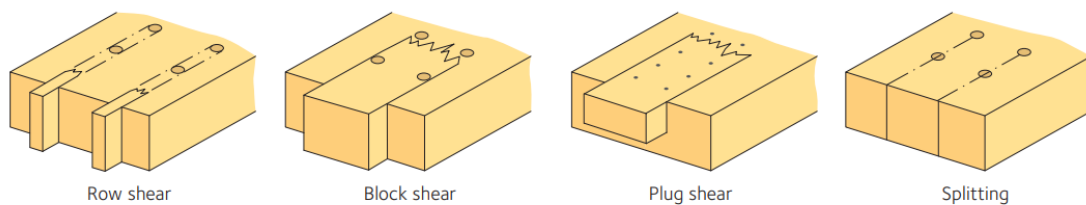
Brittle failure modes for doweled timber connection (Swedish Wood, 2019).
